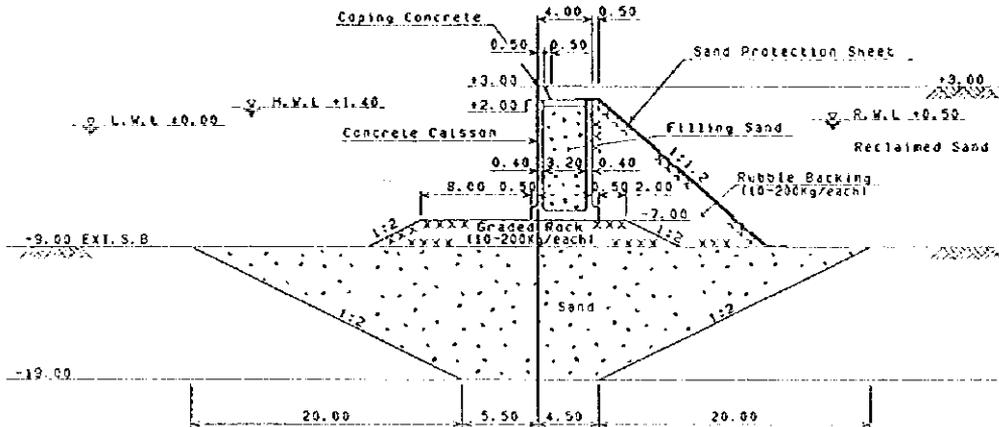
(2) Typical Cross Section of Revetment 2 (RC Caisson)
